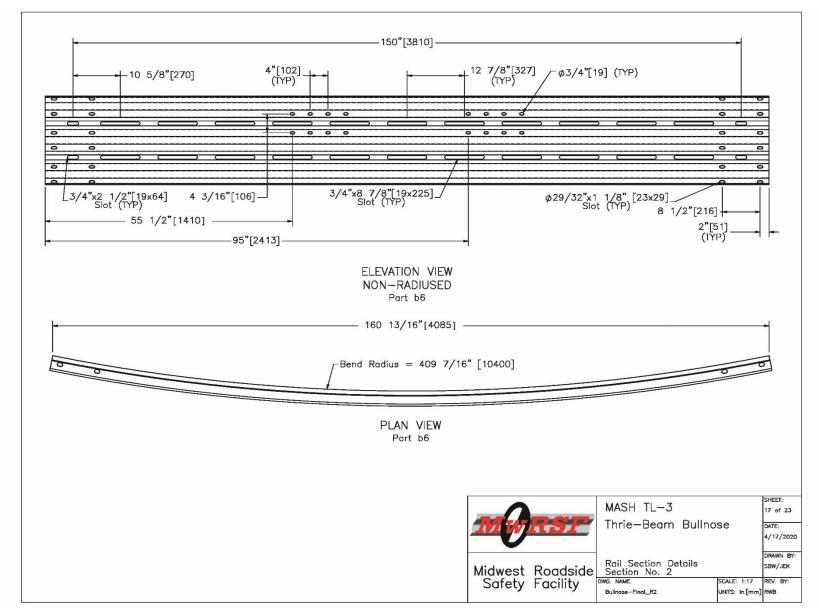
Rail Section Details, Section No. 2, Bullnose Final
